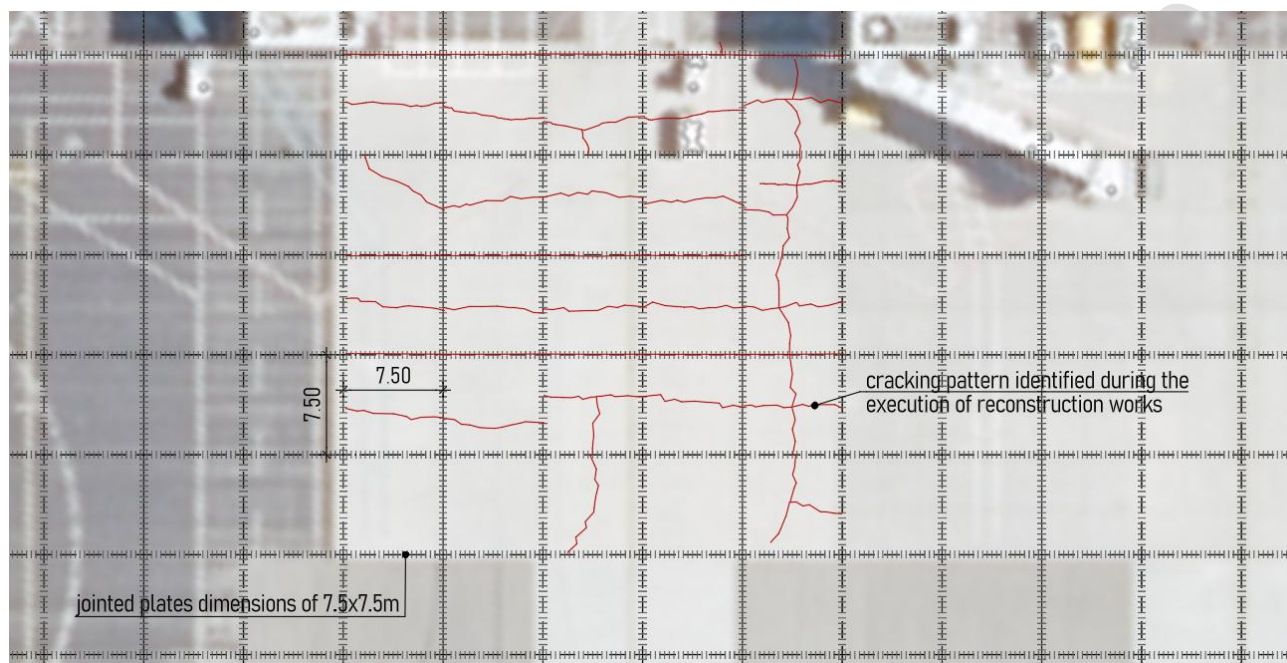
Elevation view section of old concrete slabs area with recorded cracking pattern during execution of reconstruction works (Aerodrom Ljubljana, d.d.: 2011).
